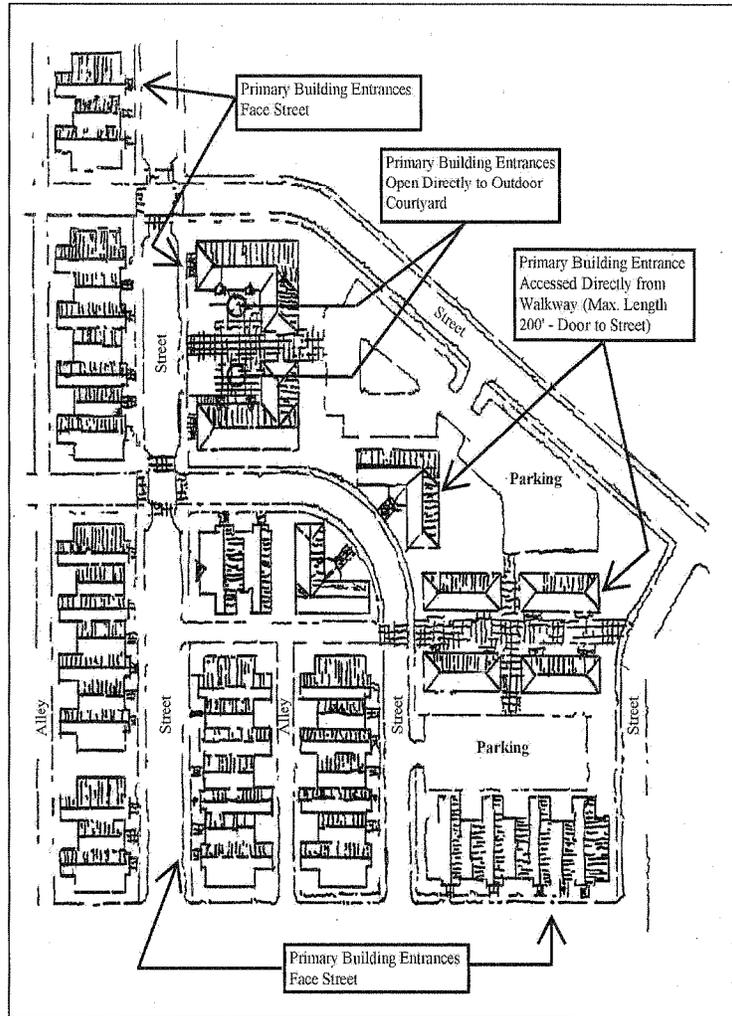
Primary Building Entrances Within 200 Ft. of the Street
